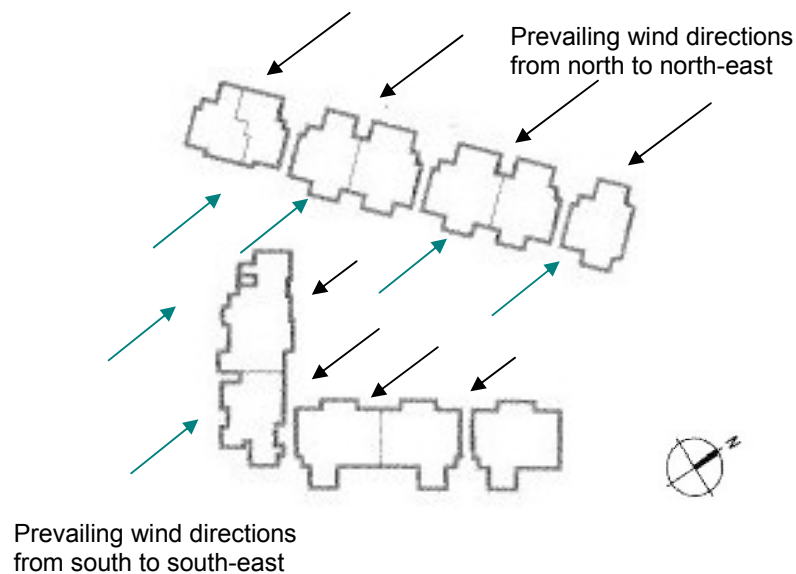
Building layout showing all dwelling units with window openings facing the north and south direction. In this instance, all units can be considered meeting the requirement 1-2(a) Option 2(i)
